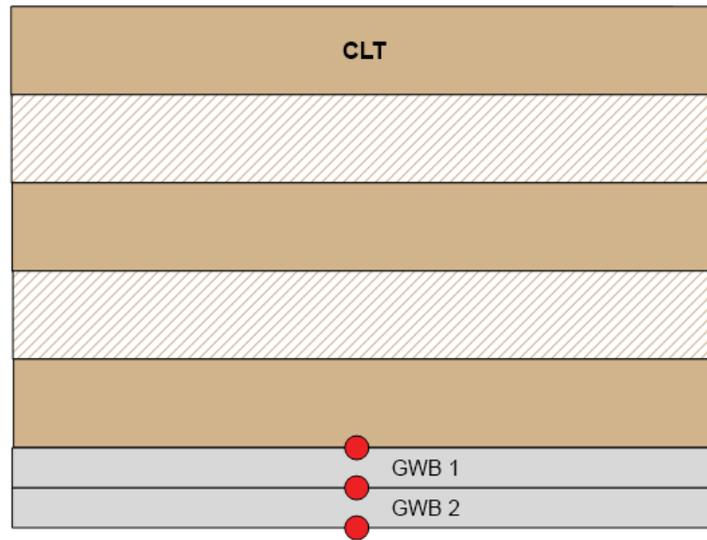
Additional surface thermocouples when the cross-laminated timber (CLT) was encapsulated (GWB, gypsum wallboard).
